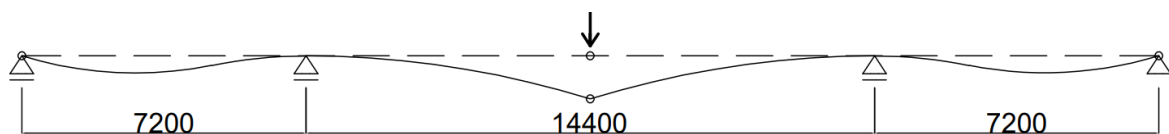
Interior or facade column removed, double span beams supported loaded at the hinge
